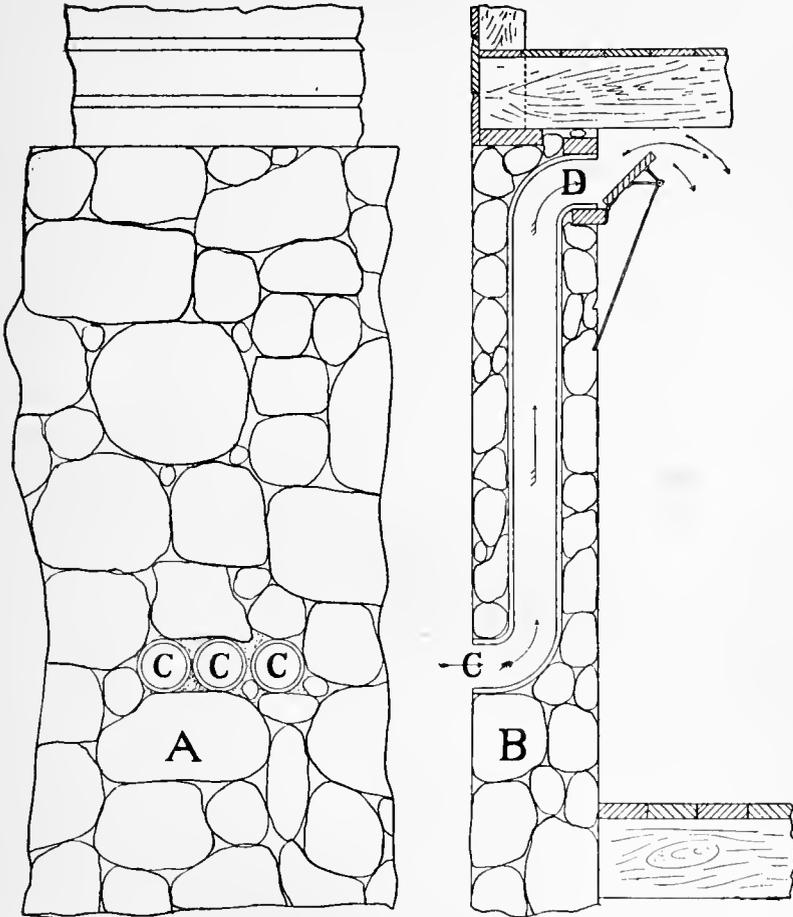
Method of installing a fresh-air intake in a stone wall during construction. Front elevation A shows openings CCC. Cross section B shows the air intake CD. This intake is constructed of vitrified sewer pipe.
